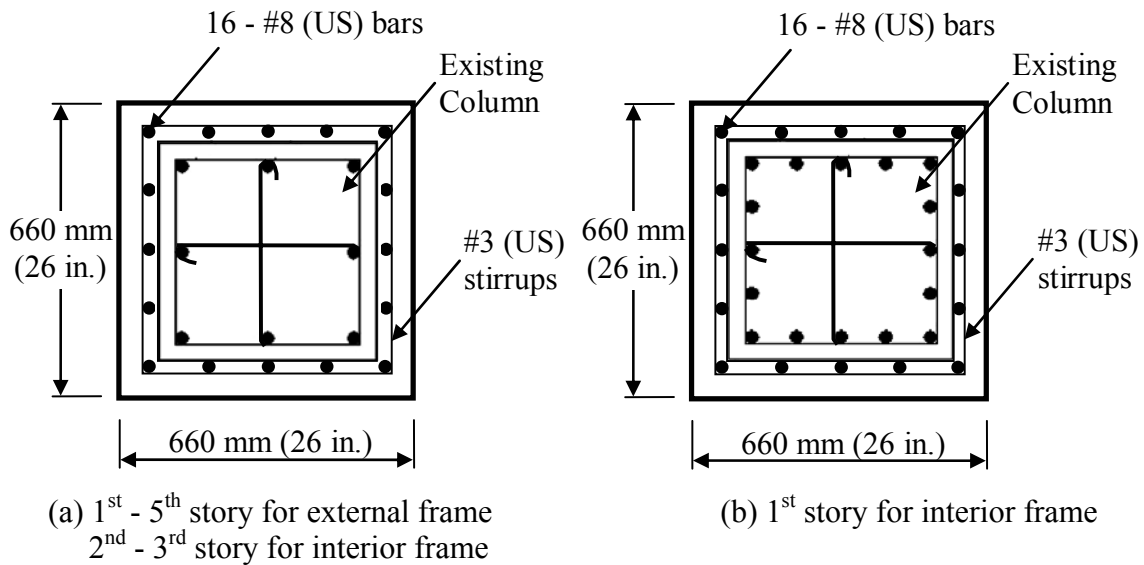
Cross-sectional details of RC column jacket retrofit
